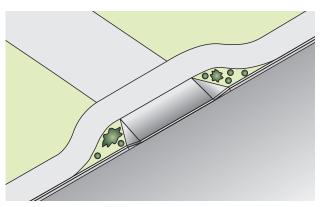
Curb tight sidewalk wraps to the back of driveway
